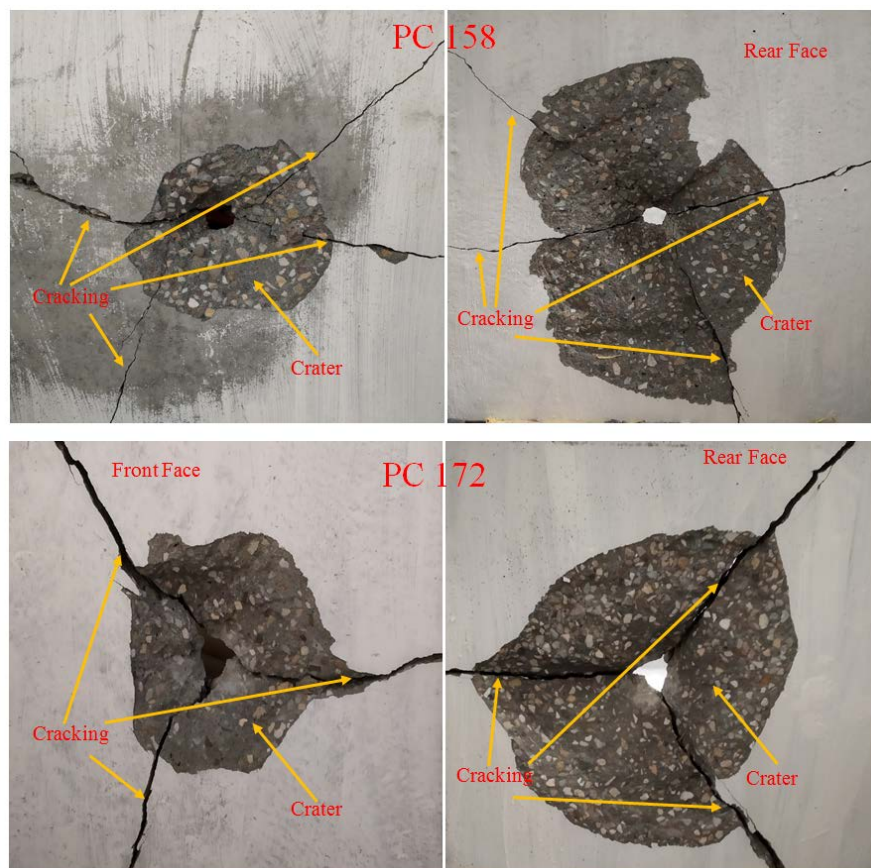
Typical perforation phenomena in plain and reinforced concrete plates
